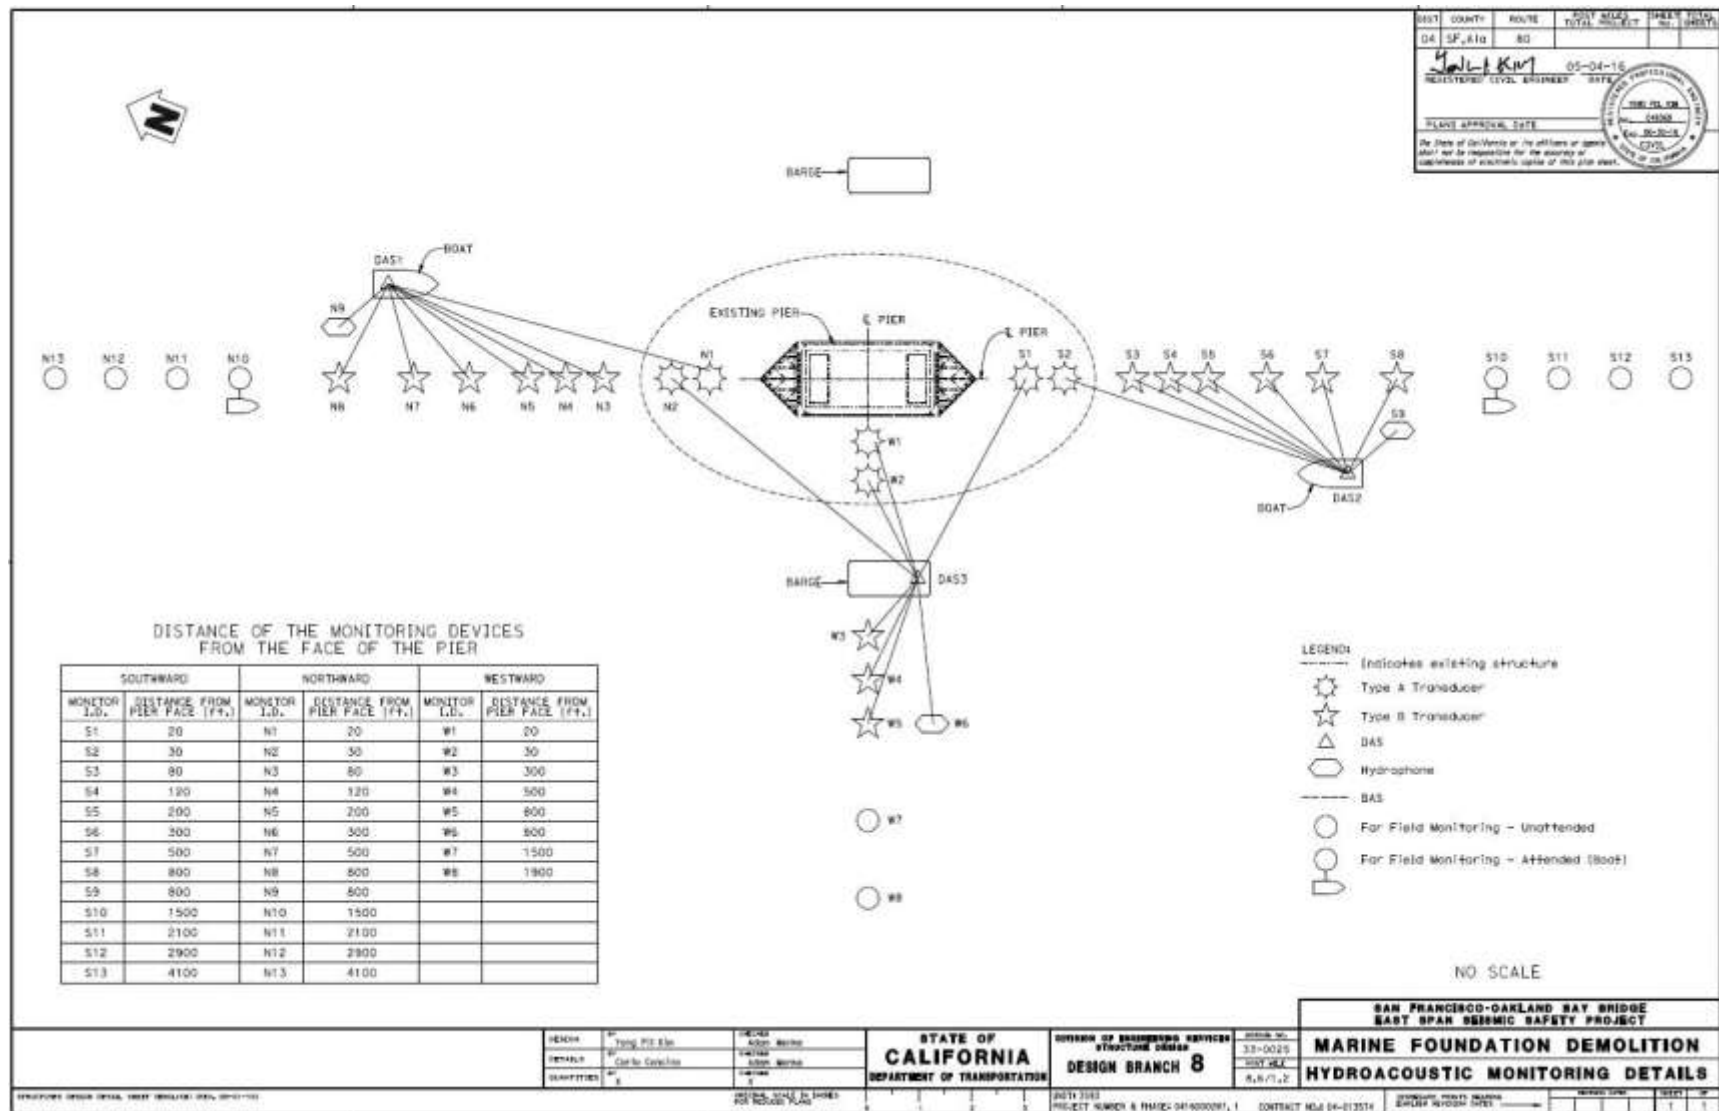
Piers E4 and E5 Proposed Hydroacoustic/Blast Pressure Monitoring Locations
